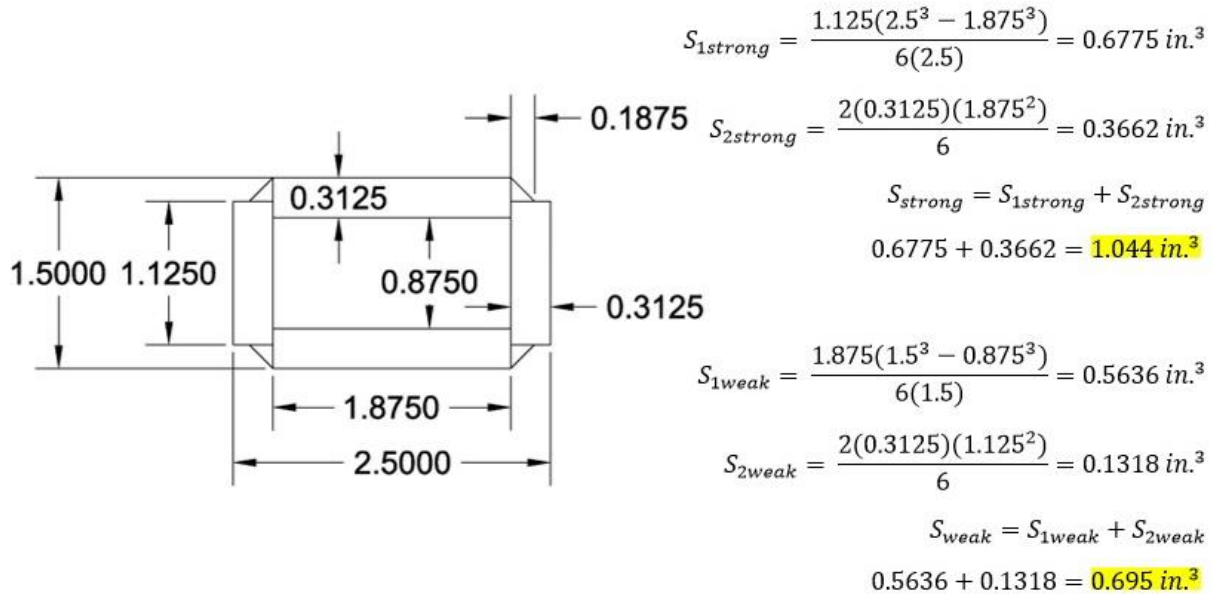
Built-Up Splice Tube Section Moduli Calculations
